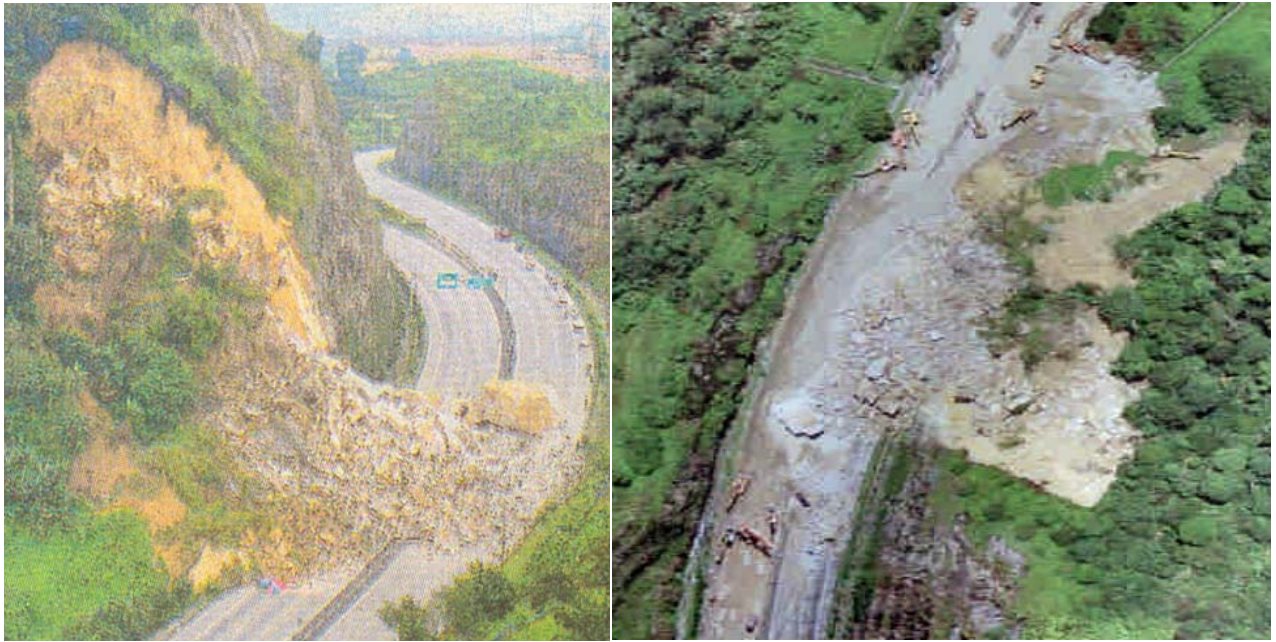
Rock Slope Failure at Bukit Lanjan, 2003 (newspaper cutting, New Straits Times)
